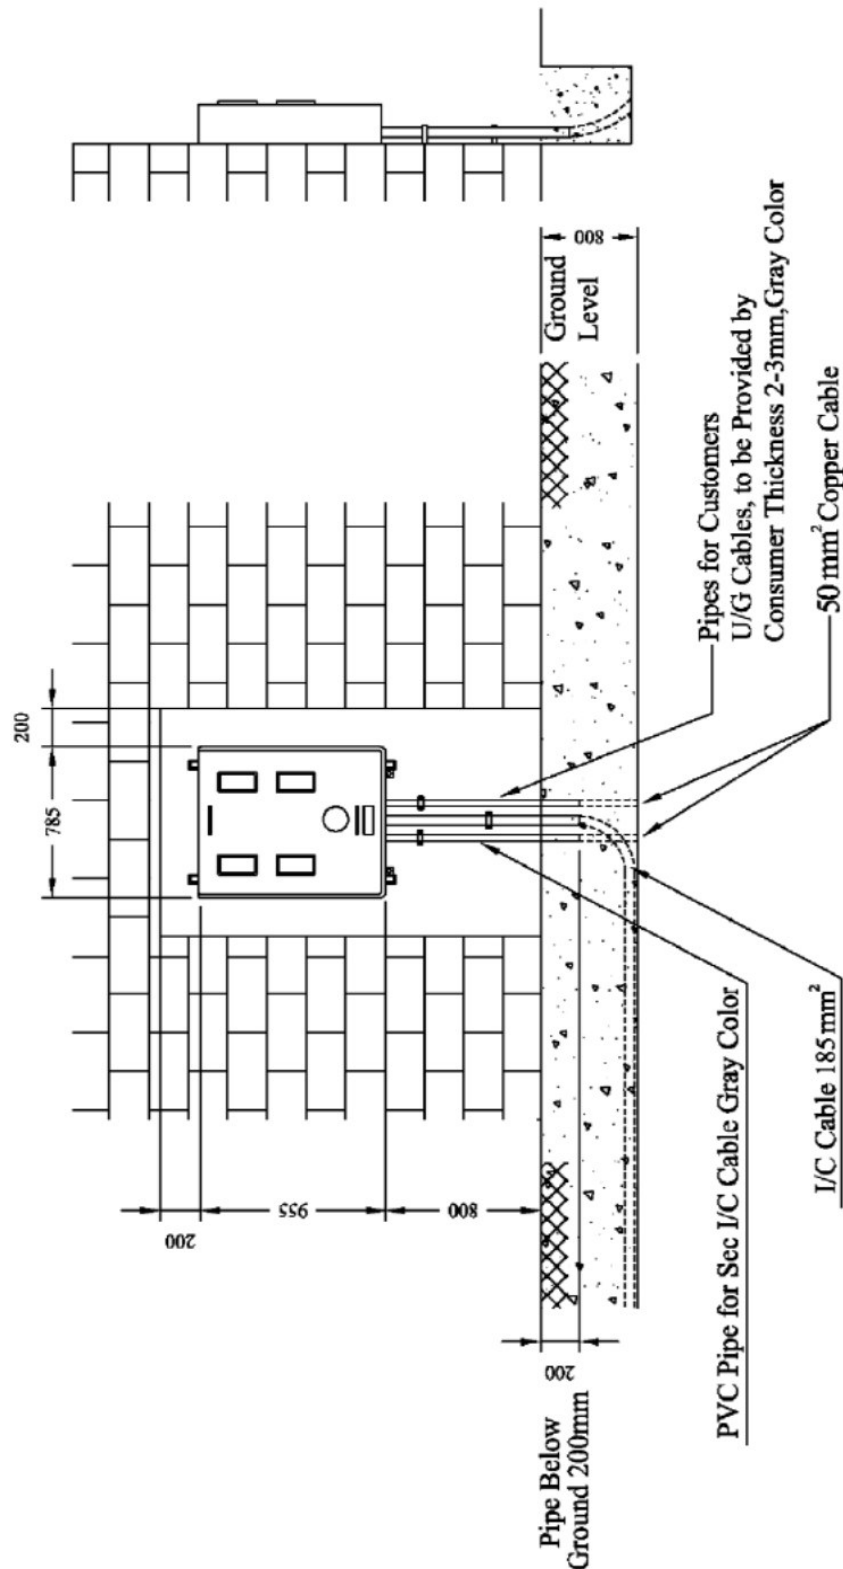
Installation of 2 Direct KWH Meters on the Front Wall
